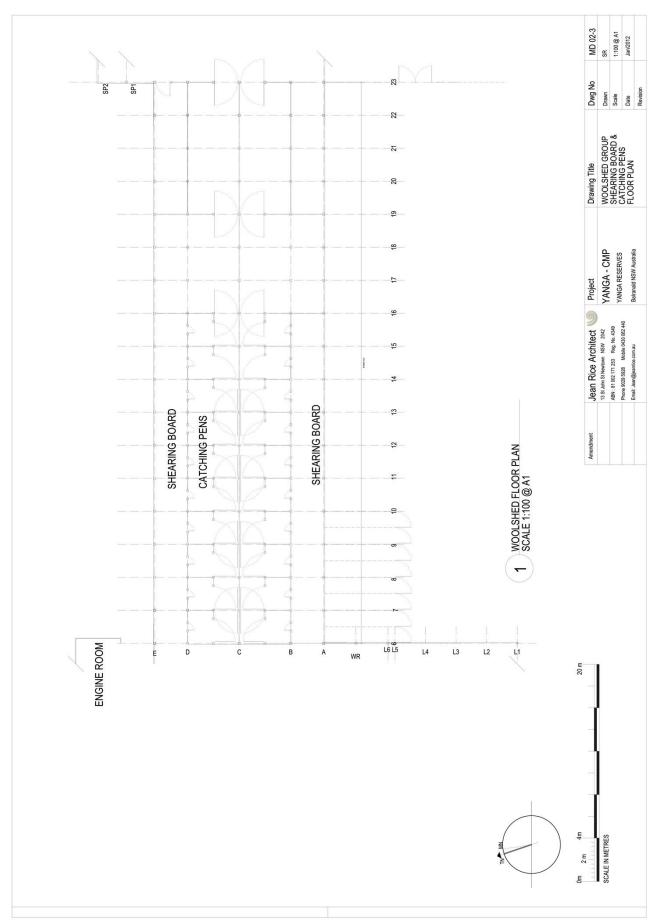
Woolshed Group. Woolshed - Shearing Board and Catching Pens floor plan. Jean Rice Architect, site assessment 2009.
